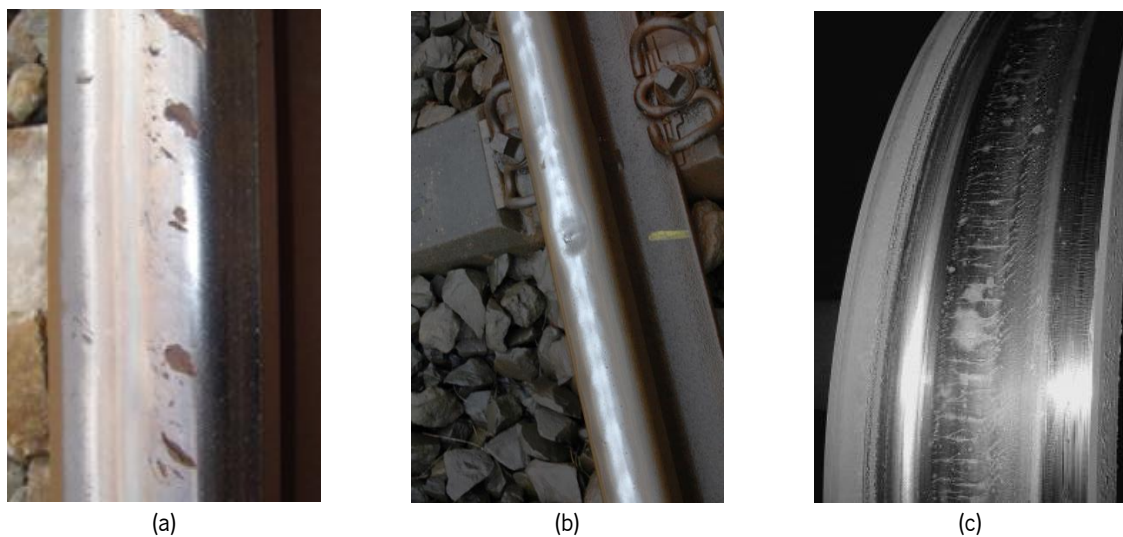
Defects resulting from the rolling contact fatigue, namely (a) head checks, (b) squats and (c) wheel pitting.
